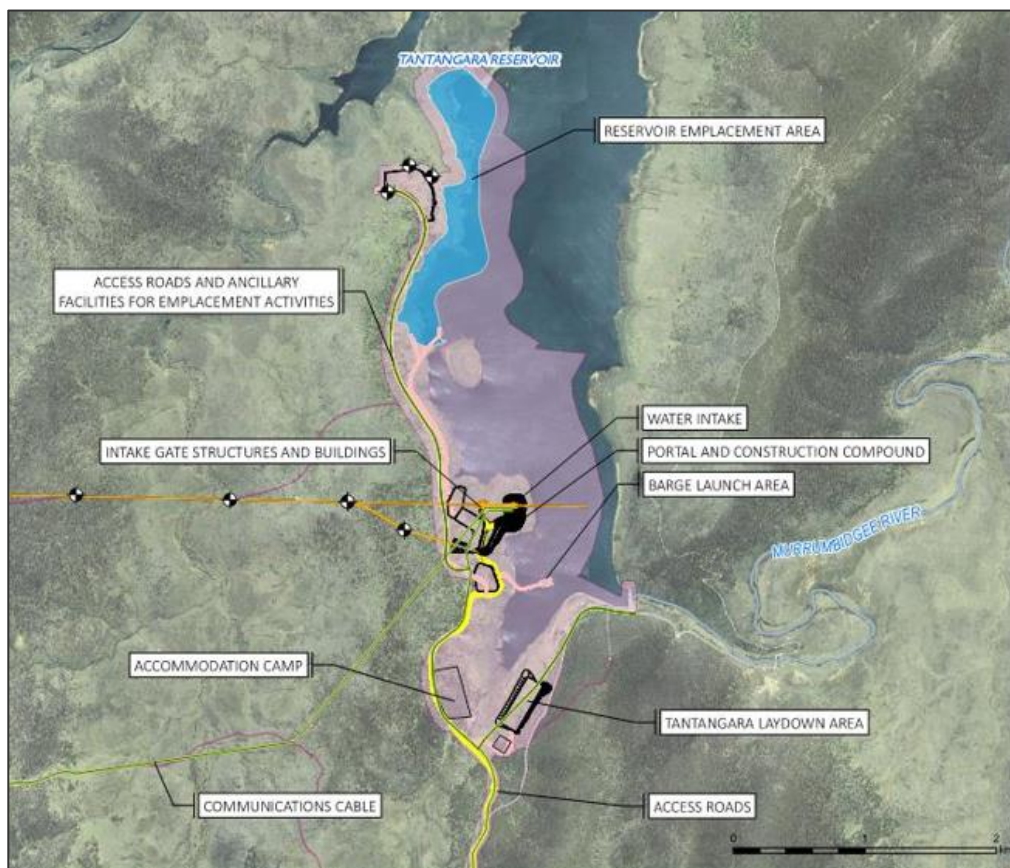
Tantangara Reservoir – excavated rock emplacement footprint
